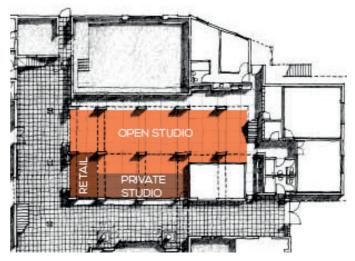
BAT centre spatial studio floor plan, not to scale (Mikula 1994) (Edited by author 2014)
